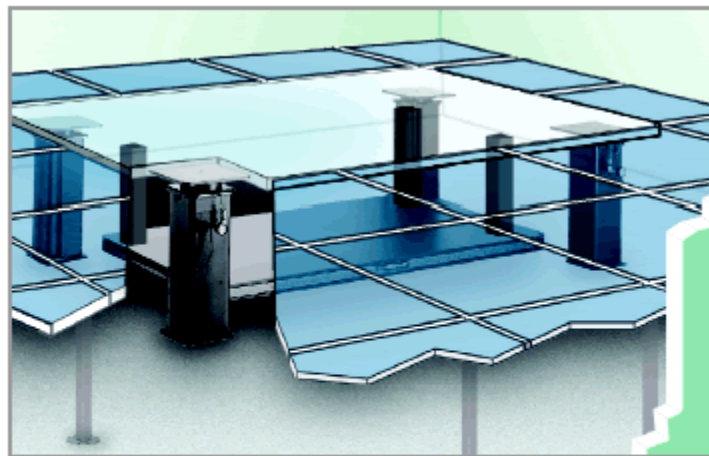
Vibration-free “islands” can be installed at the sub-floor level in a raised-floor cleanroom to provide a pedestal isolated from the vibrations from nearby foot traffic and other ambient building vibrations such as local truck or rail traffic and HVAC machinery.
